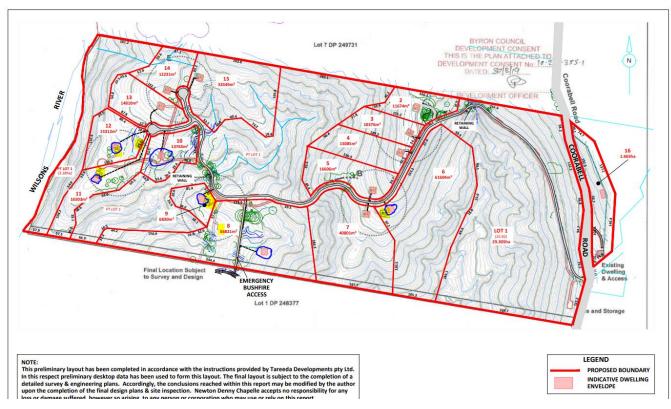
Site overlay comparing approved MO layout with Proposed Community Title Plan
